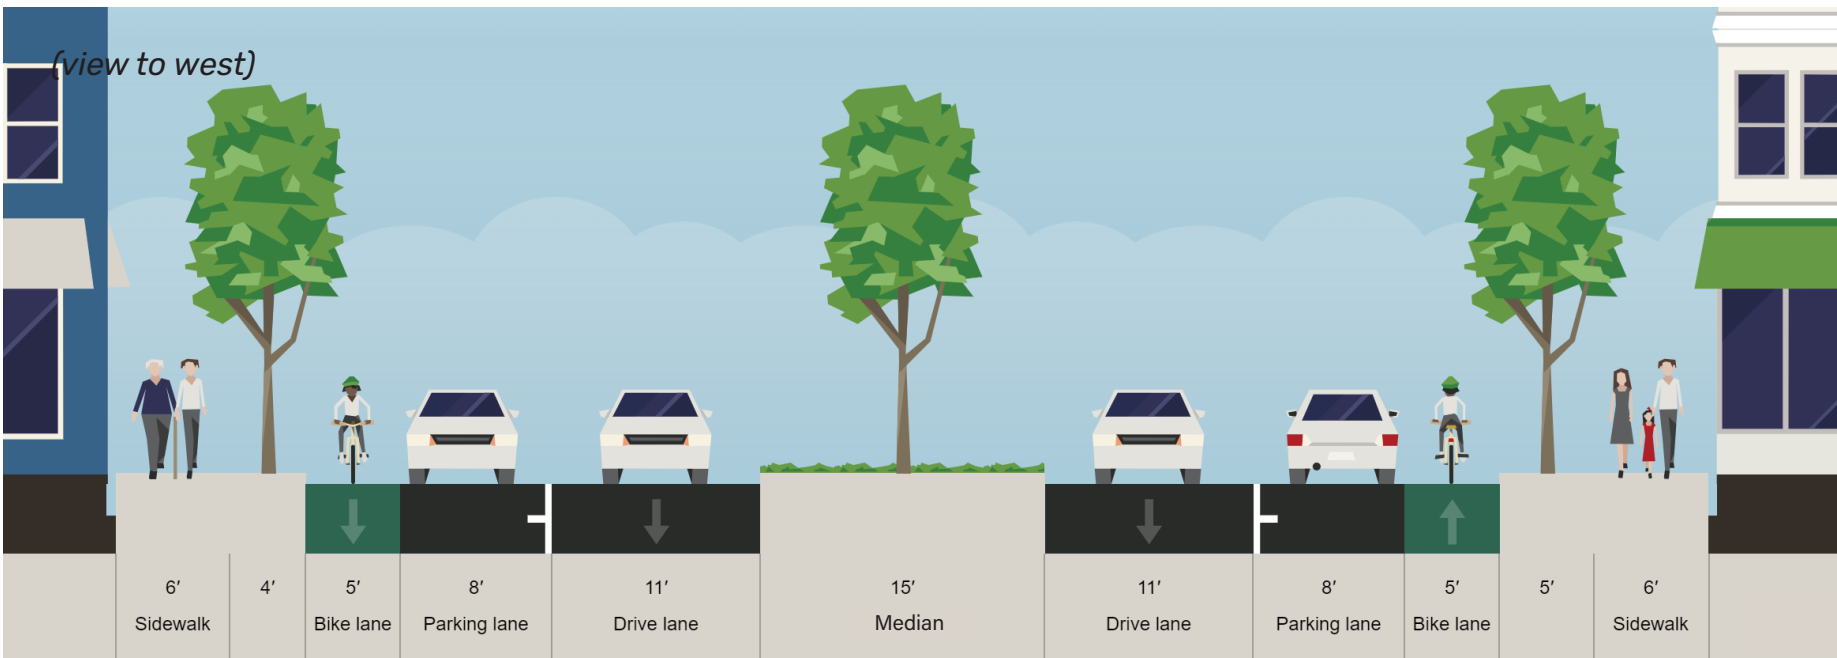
Proposed Typical Cross-Section on Corinth Parkway (IH 35 to Creek Bend Drive) (84’ ROW)
